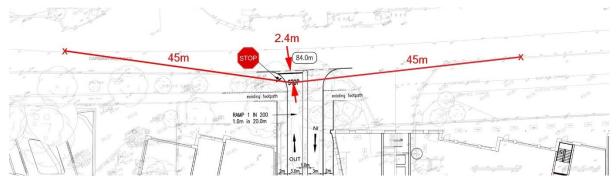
Junction 5: Site Access – Carmanhall Road (Traffic lane widths 3.0m internal and 3.25m external)
